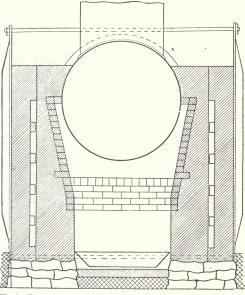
Front Elevation of Boiler in Setting, Showing Binders Bolted in Place, to Strengthen Side Walls.
